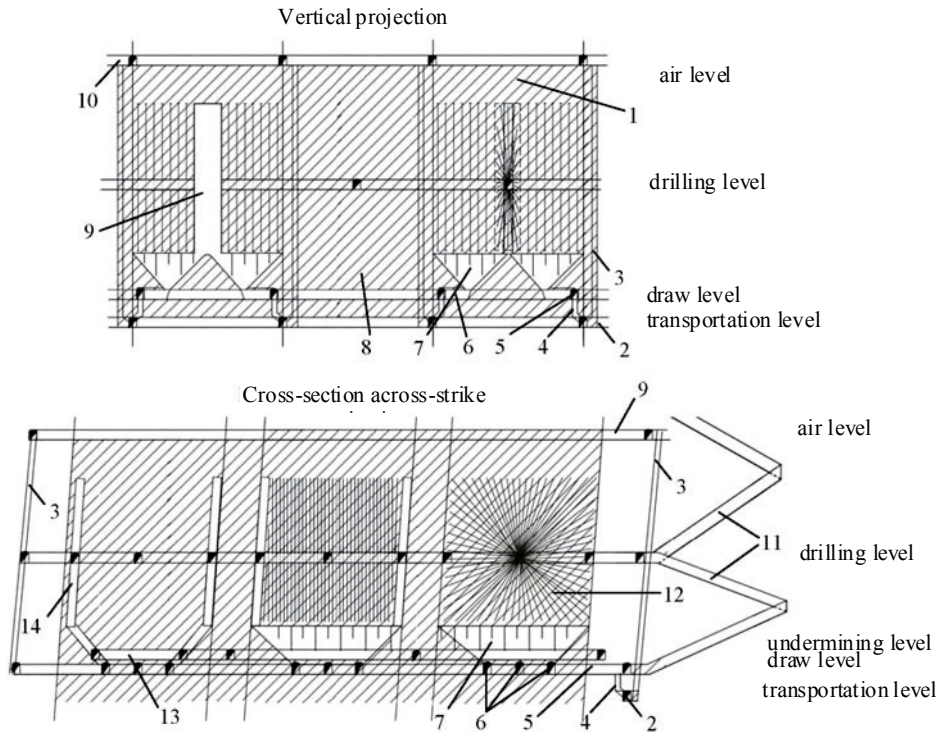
Level room development with dirt inclusions leaving in the section: 1 – primary stope (room); 2 – hauling roadway; 3, 4 – raise, air and passageway, ore-pass; 5, 10 – draw entry; 6 – loading rooms; 7 – ditch undercutting; 8 – stope of the second turn (room fender); 9 – vertical compensation room; 11 – spiral ramp; 12 – rings of block caving deep holes; 13 – cutoff ditch ort; 14 – cut raise.
